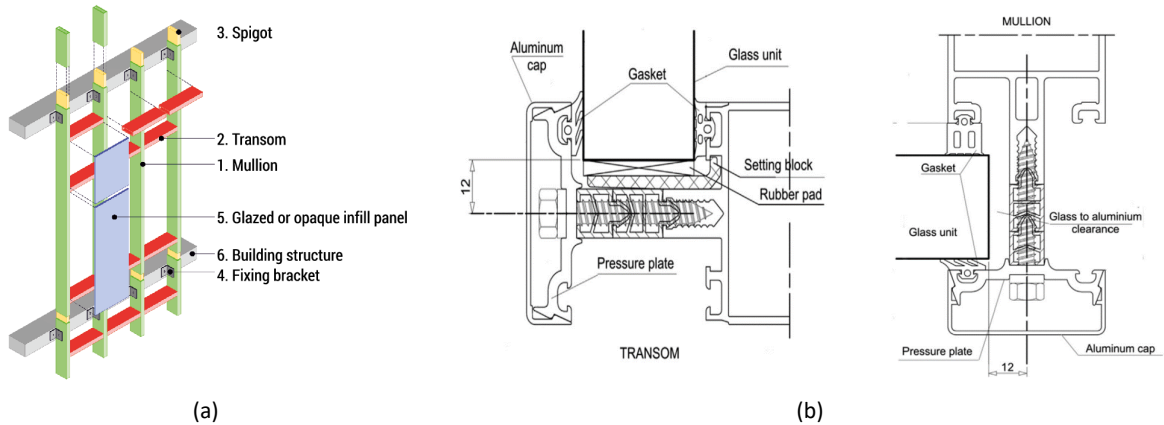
Examples of (a) stick system (Krawczyk 2020), with (b) details of frame elements and glass connection (Cella and Bedon 2024a).
